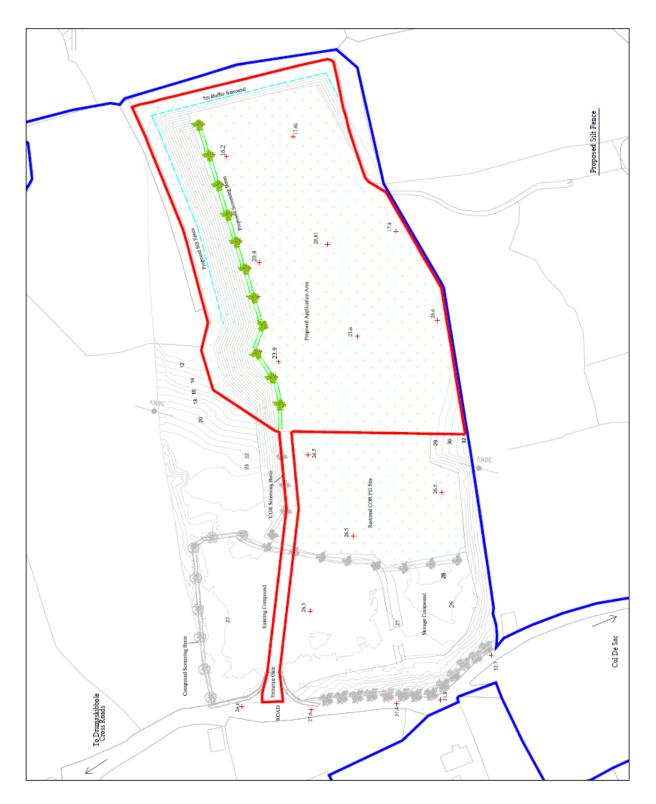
Proposed Site Layout Plan with Mitigation Measures Adopted.
